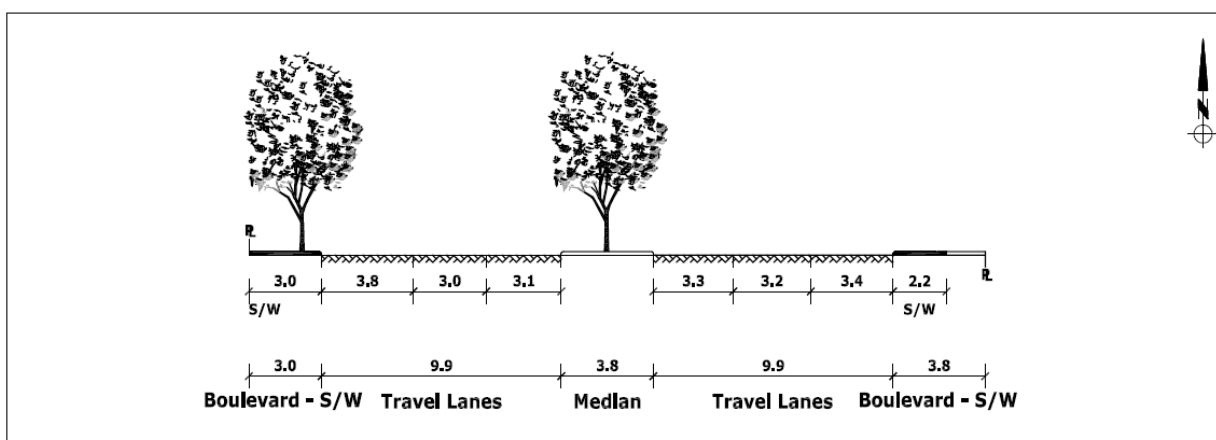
12<sup>th</sup> Avenue to 6<sup>th</sup> Avenue - Typical Pre-construction Configuration
